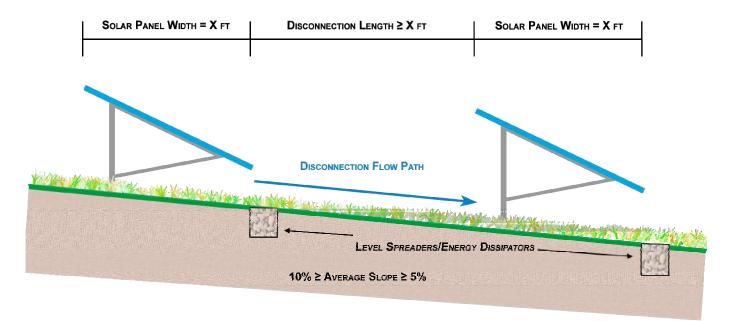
Typical Installation – Slope ≥ 5% but ≤ 10%
